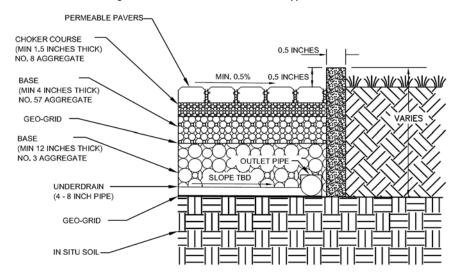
B. Permeable Pavers with Underdrain System
